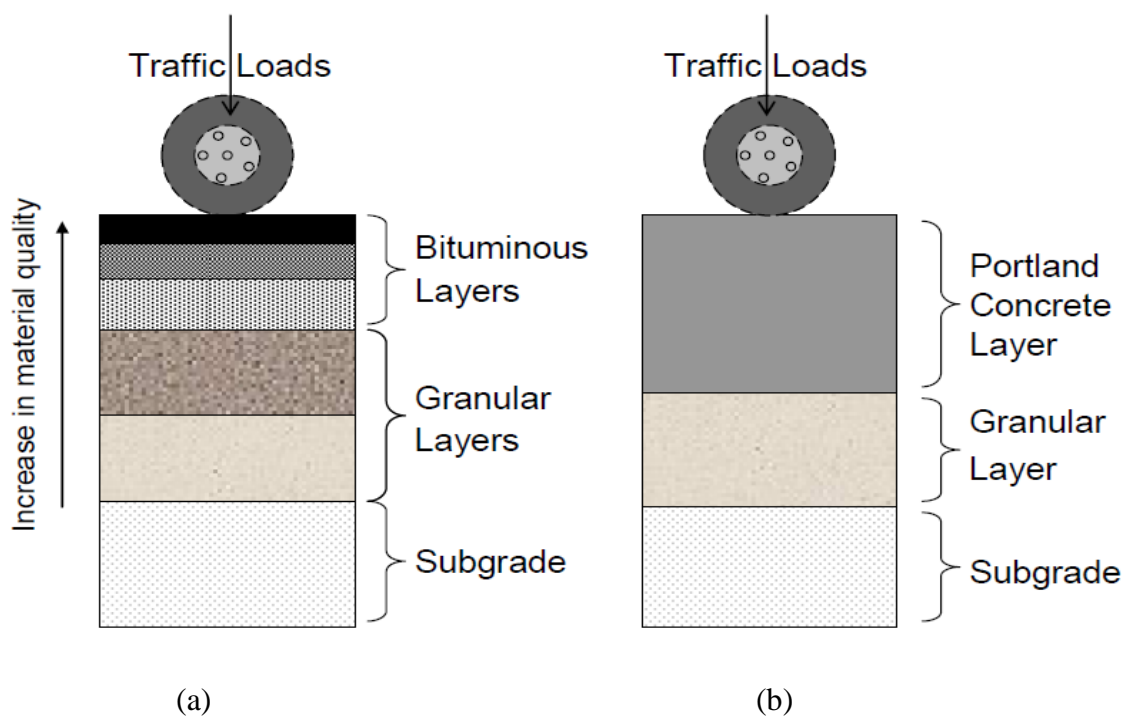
(a) Flexible Pavement and (b) Rigid Pavement (after Gonzalez, 2009) [10].
